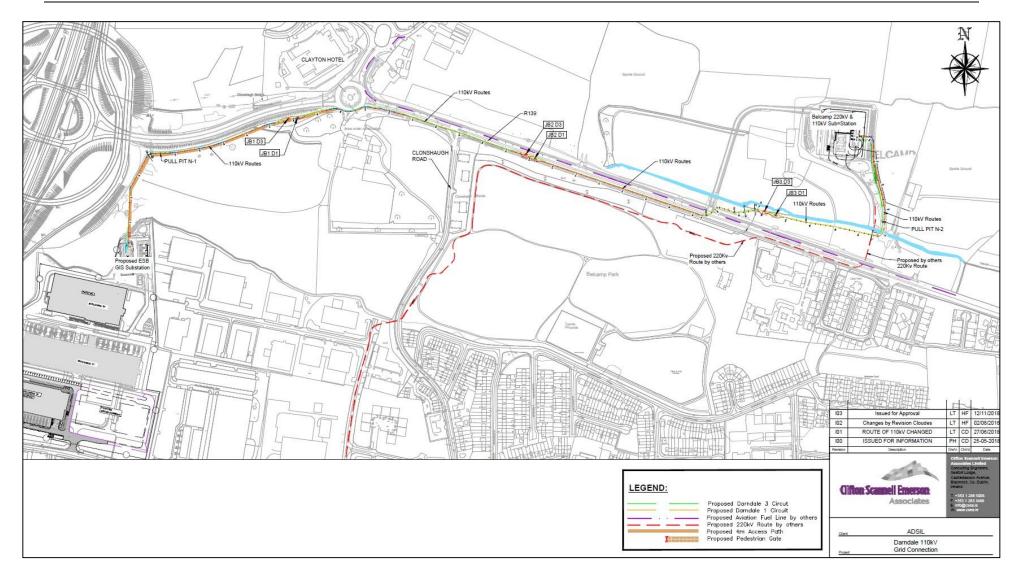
Site plan showing the proposed route of the grid connection along the R139 and through green field areas leading to the Darndale substation.
